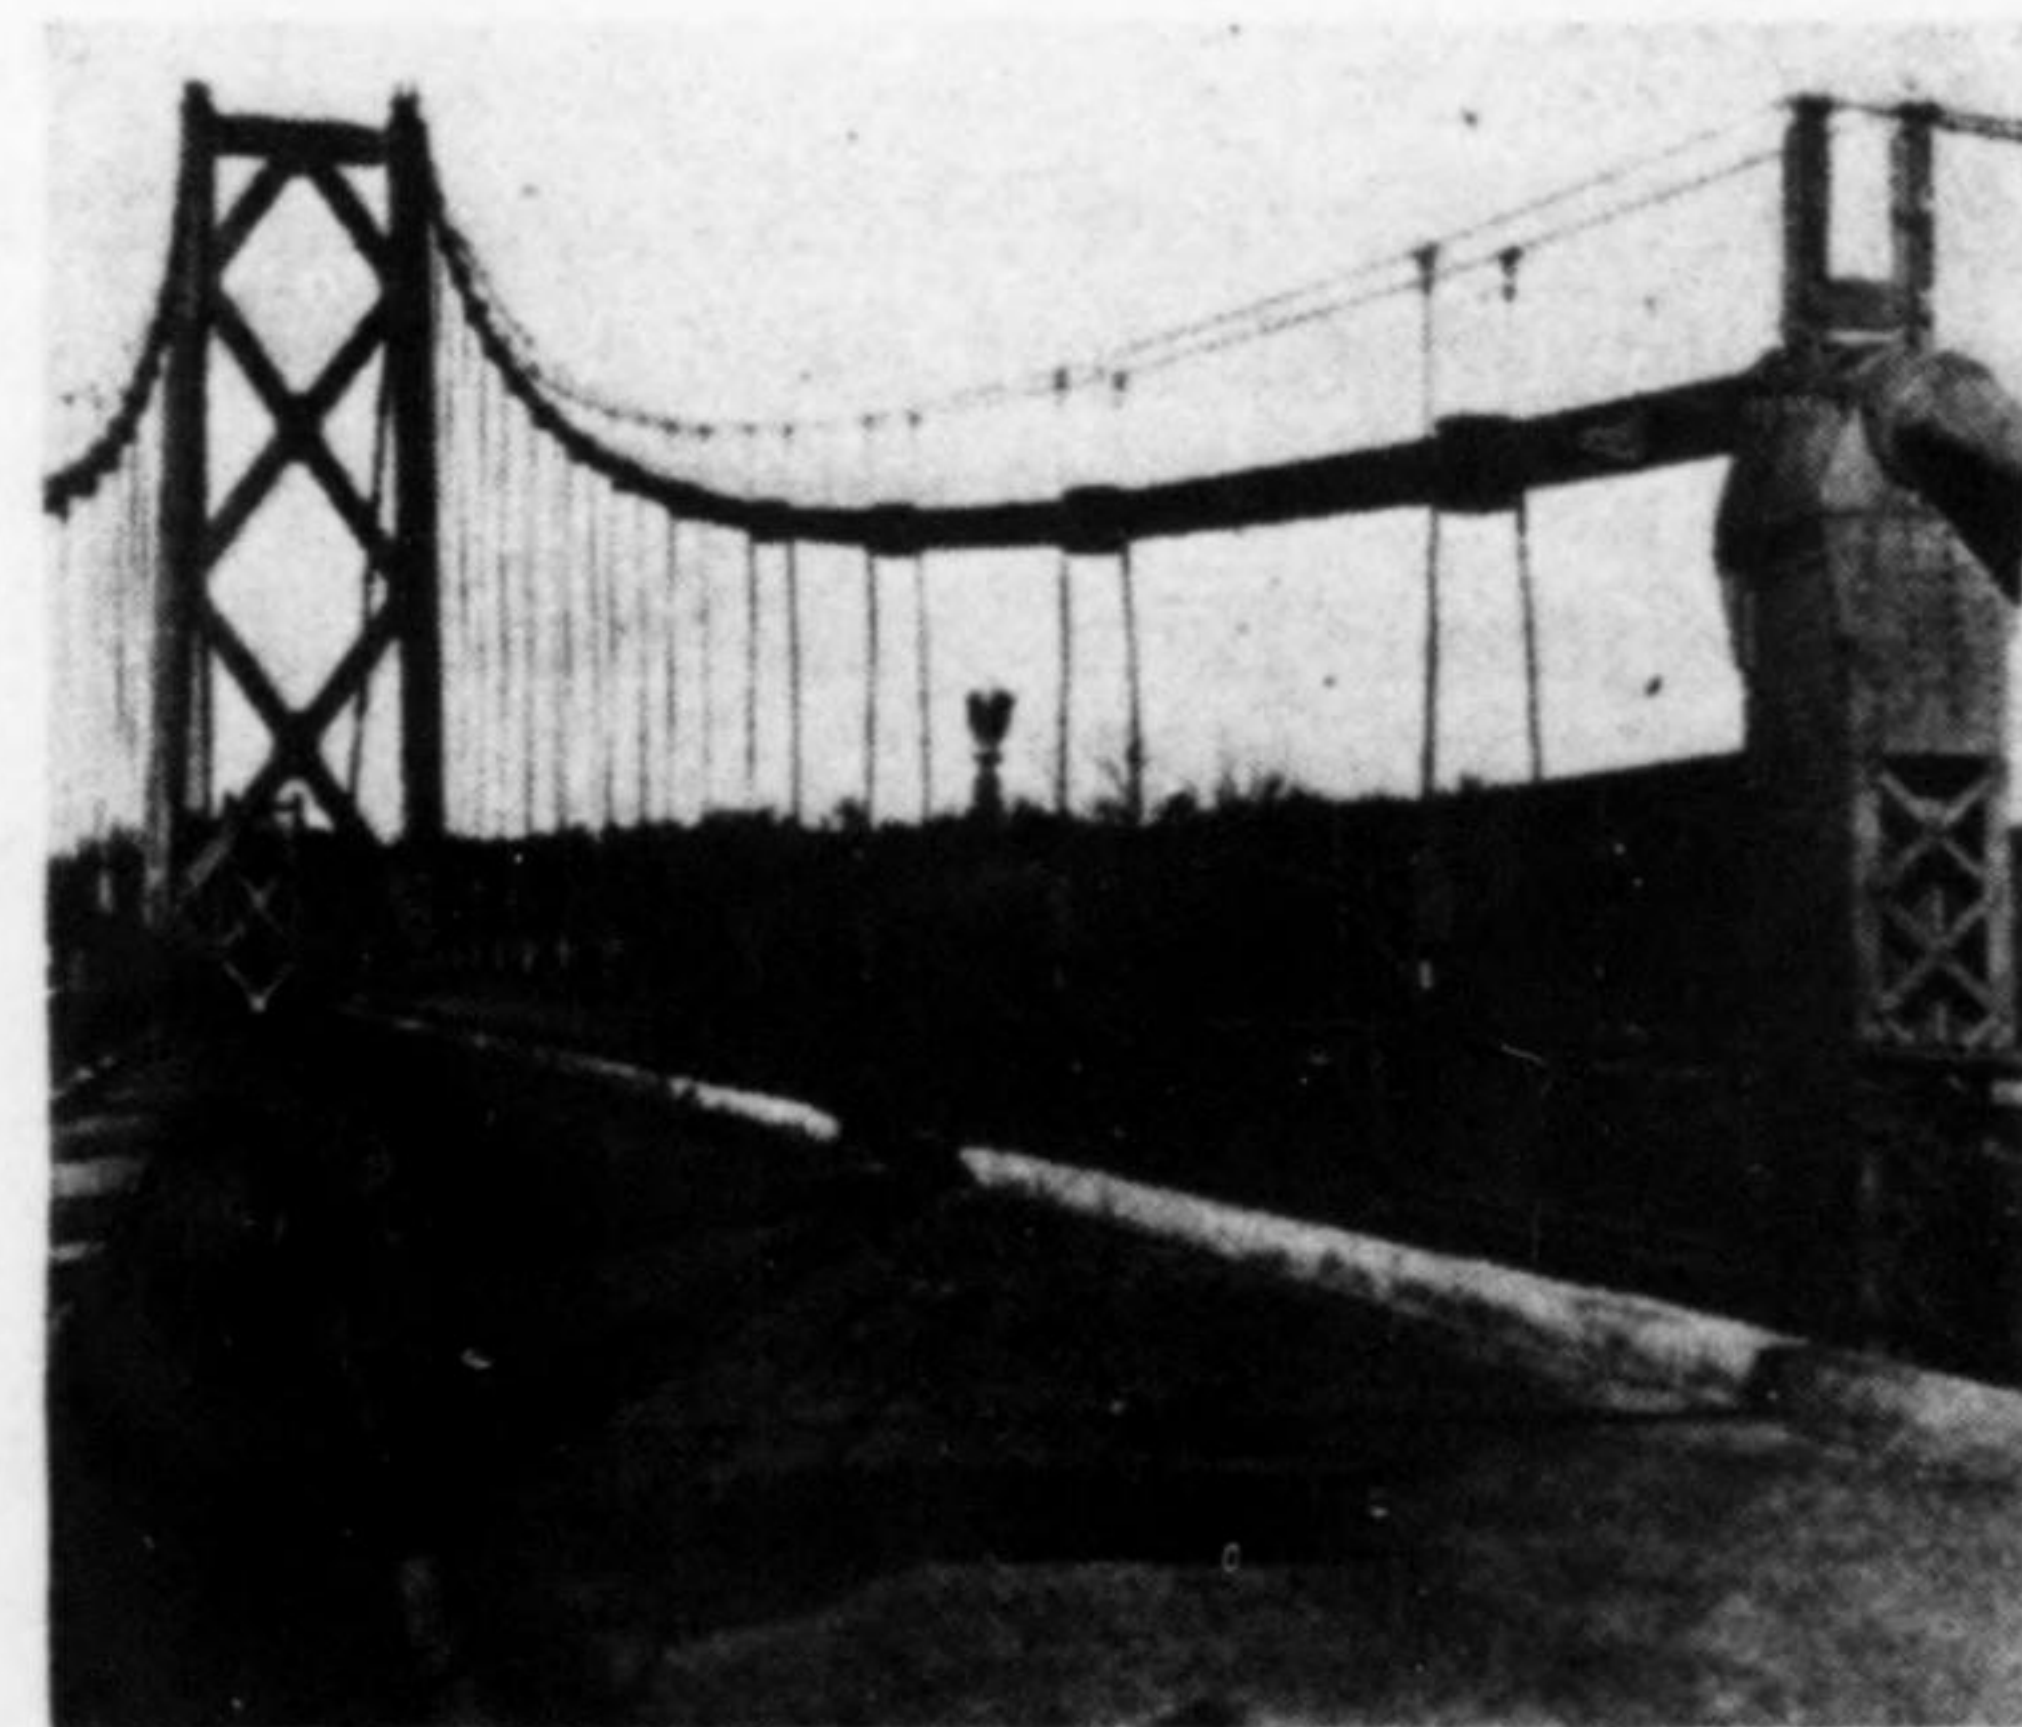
Strand-cable suspension bridge joining Maysville, Ky., and village of Aberdeen, Ohio, is an important structure in Kentucky's current tollbridge building program.
